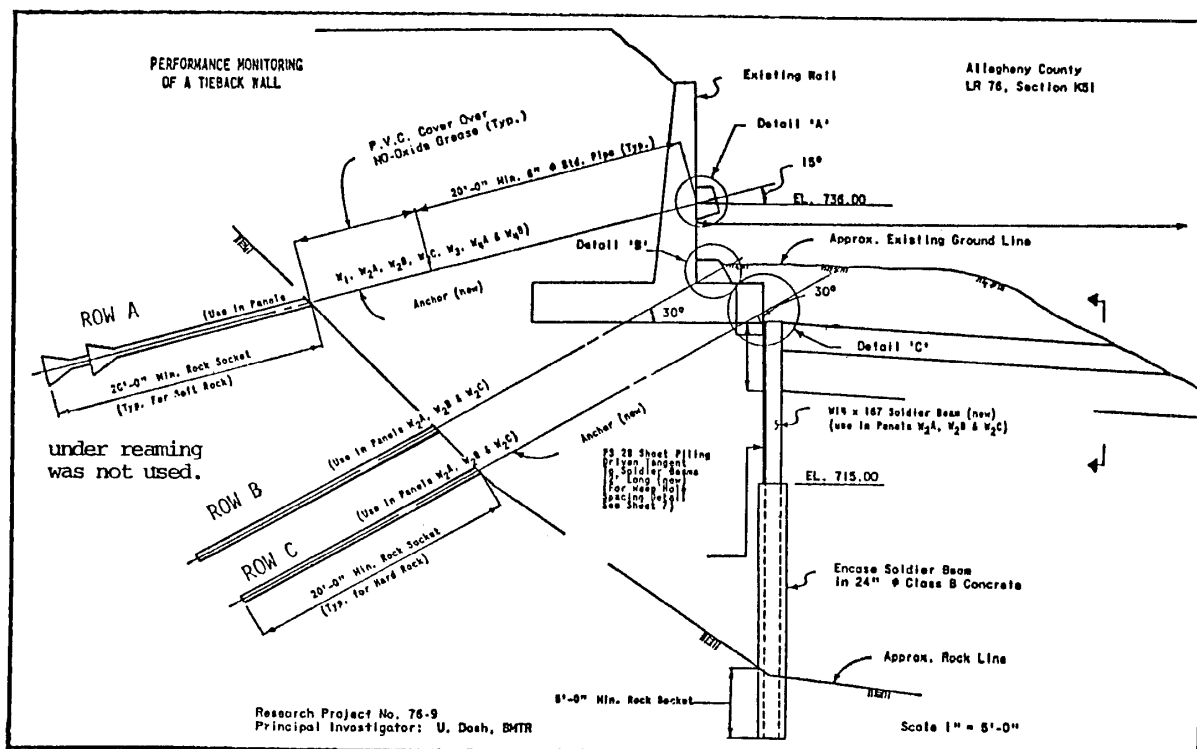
Typical cross section of the tieback wall showing rock anchors. (Dash & Deross, 1979)
